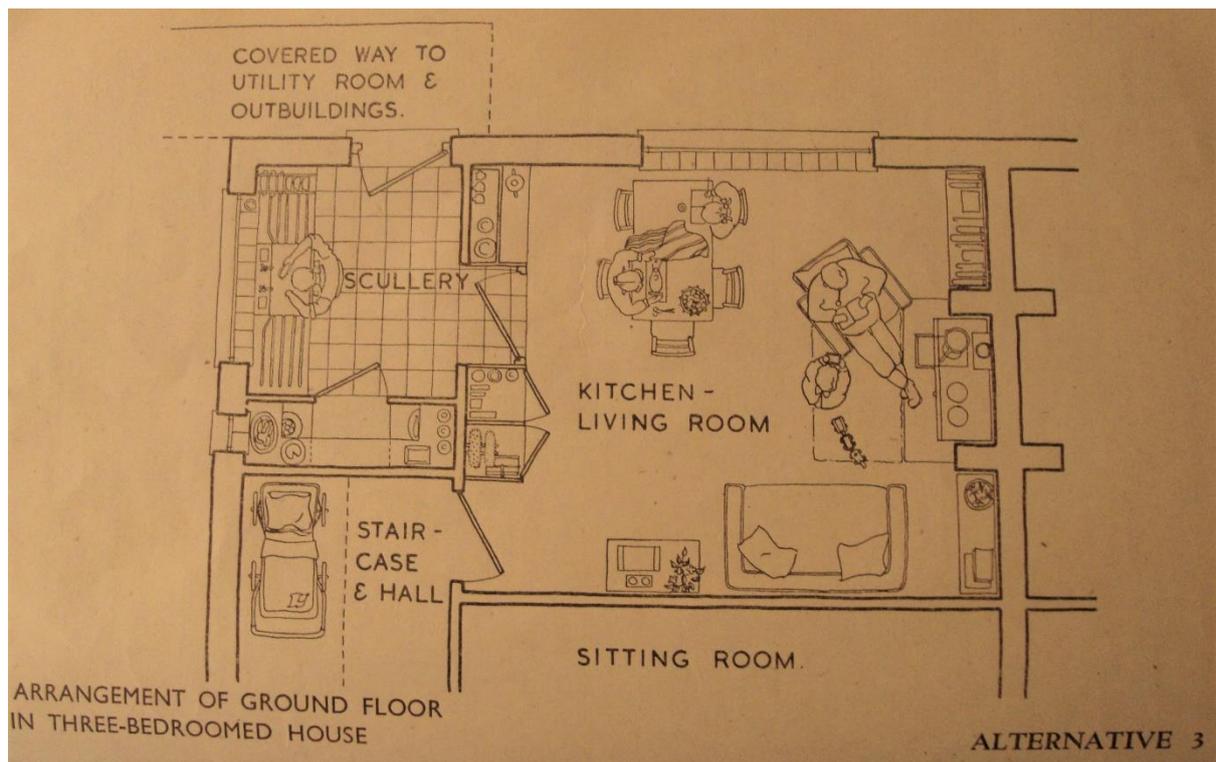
Arrangement of Ground Floor in three-bedroom house. Dudley Alternative 3 (365 sq. ft.). Source: *Design of Dwellings* (1944), 38.
